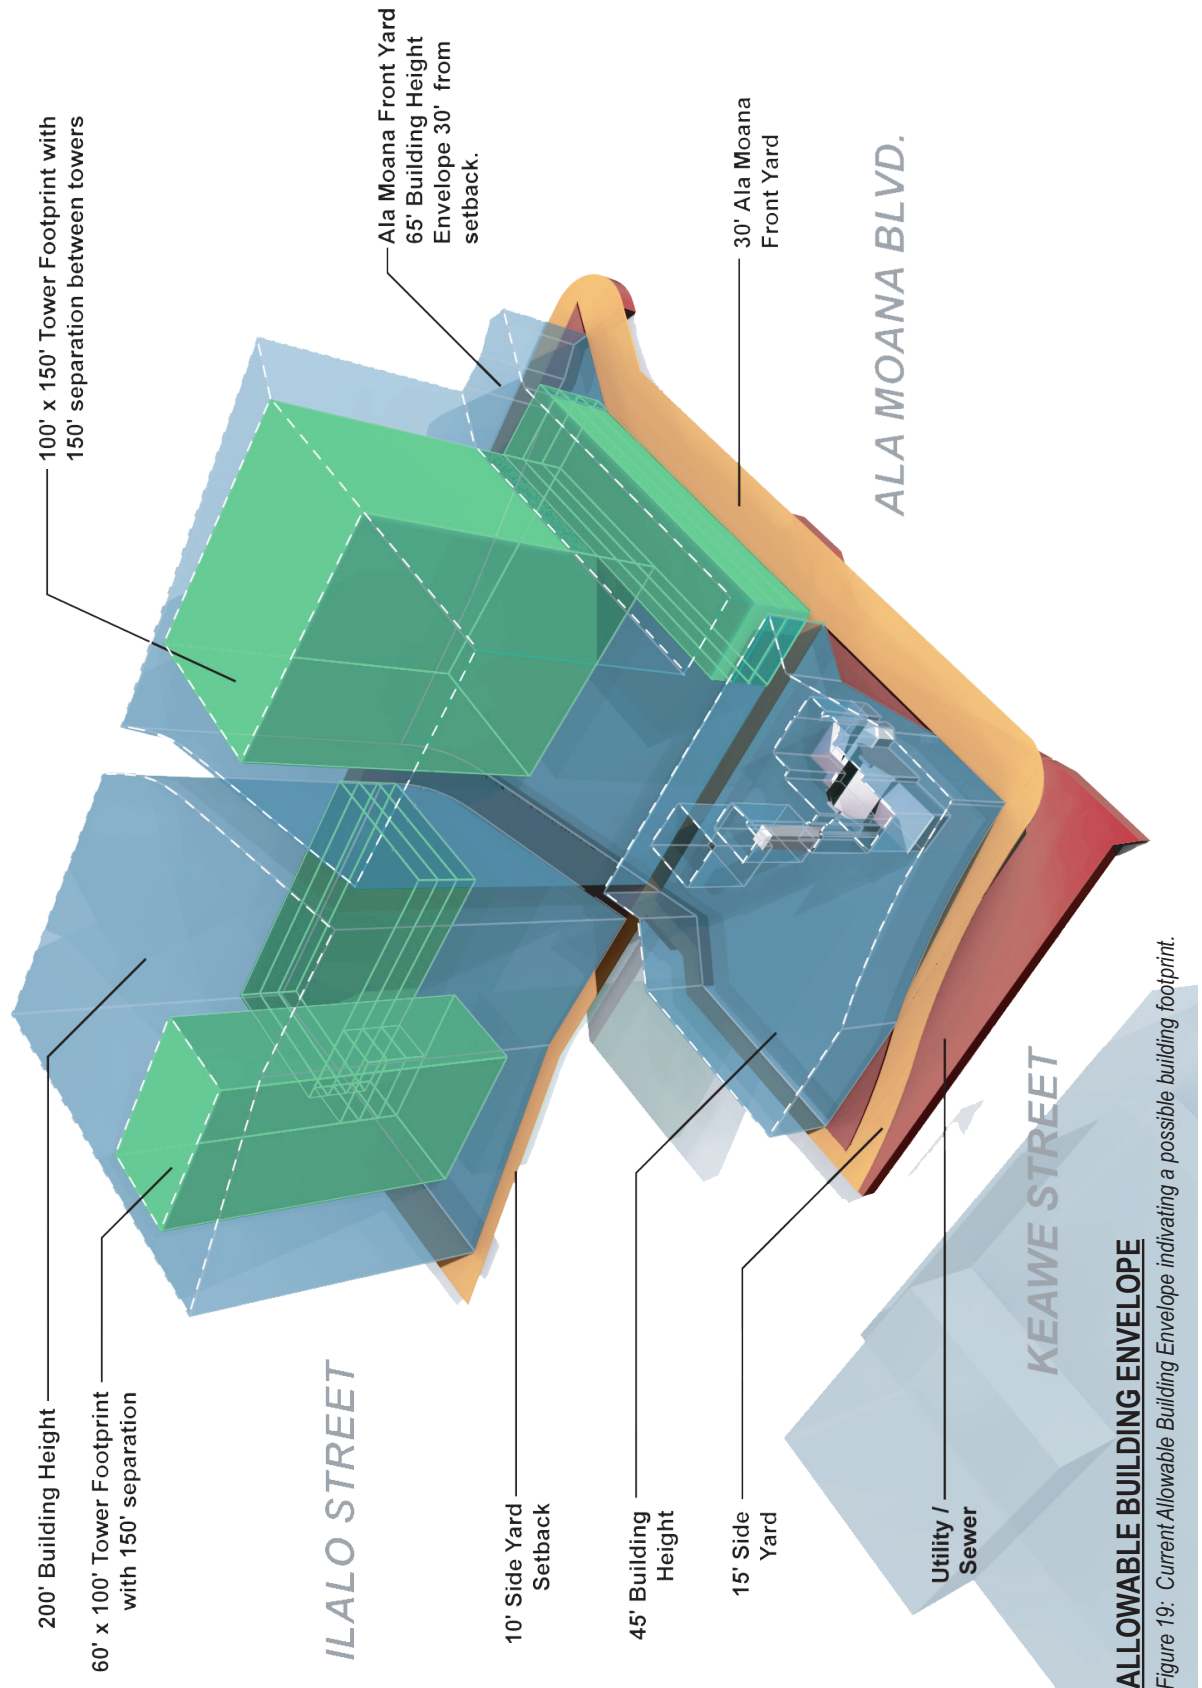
Current Allowable Building Envelope indicating a possible building footprint.
